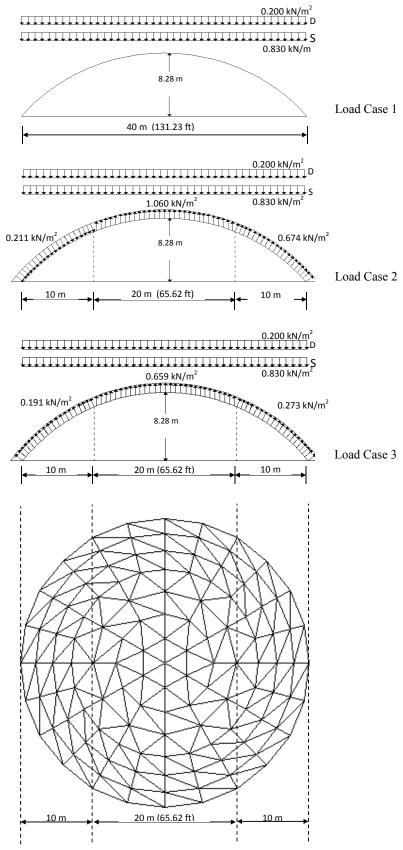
Three load cases for 354-member braced truss dome (Hasançebi et al, 2009)
